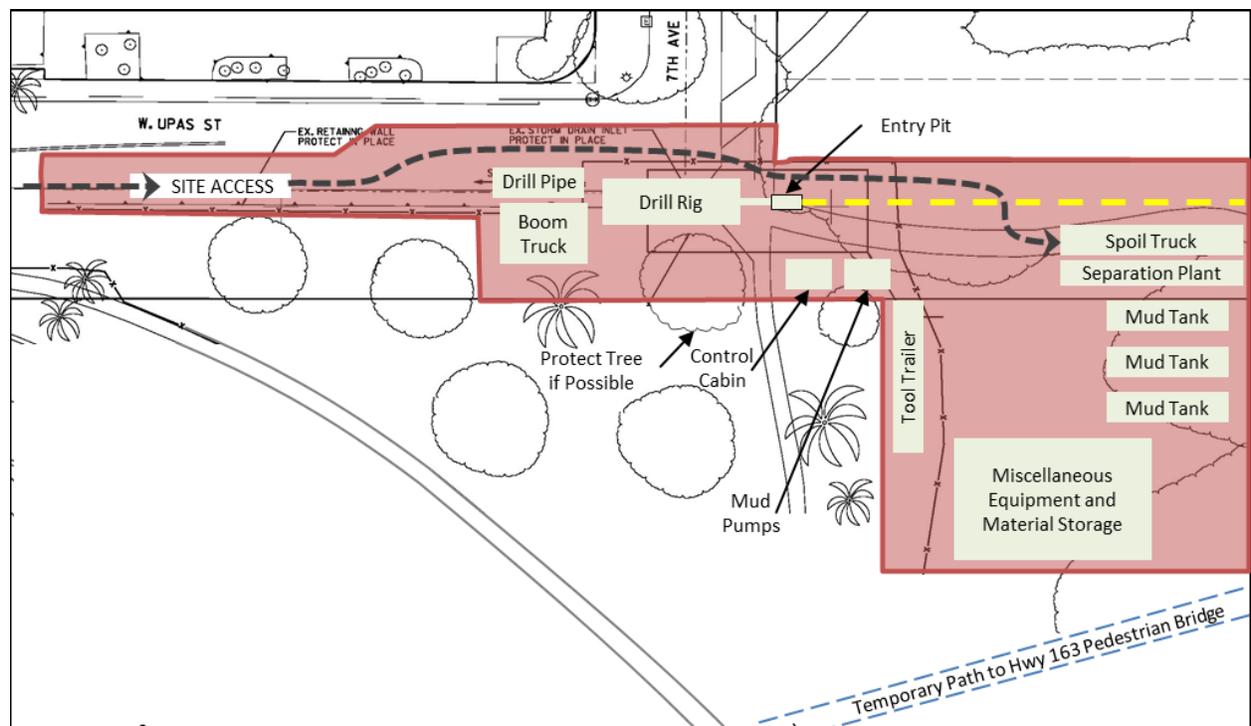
HDD Entry (Rig) Side Work Area and Example Layout (Shaded Area)
